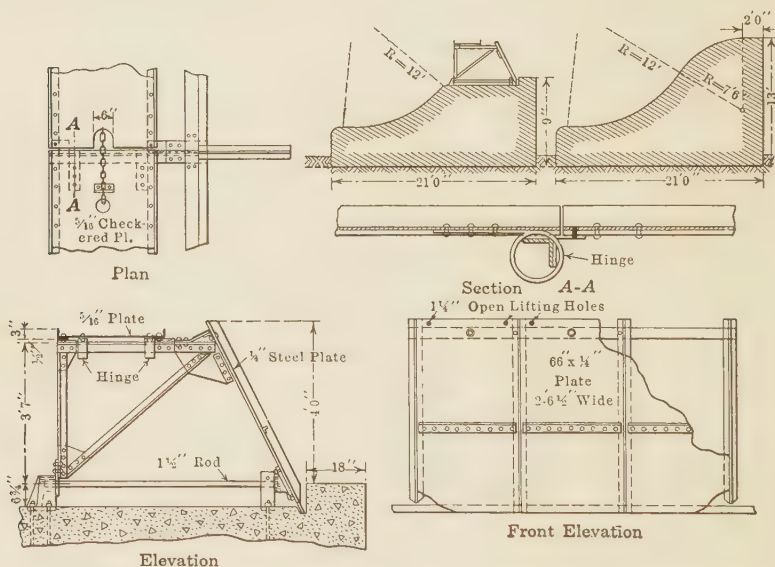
Details of collapsible gates on diversion weir of Crocker-Huffman system. Merced, Calif.
